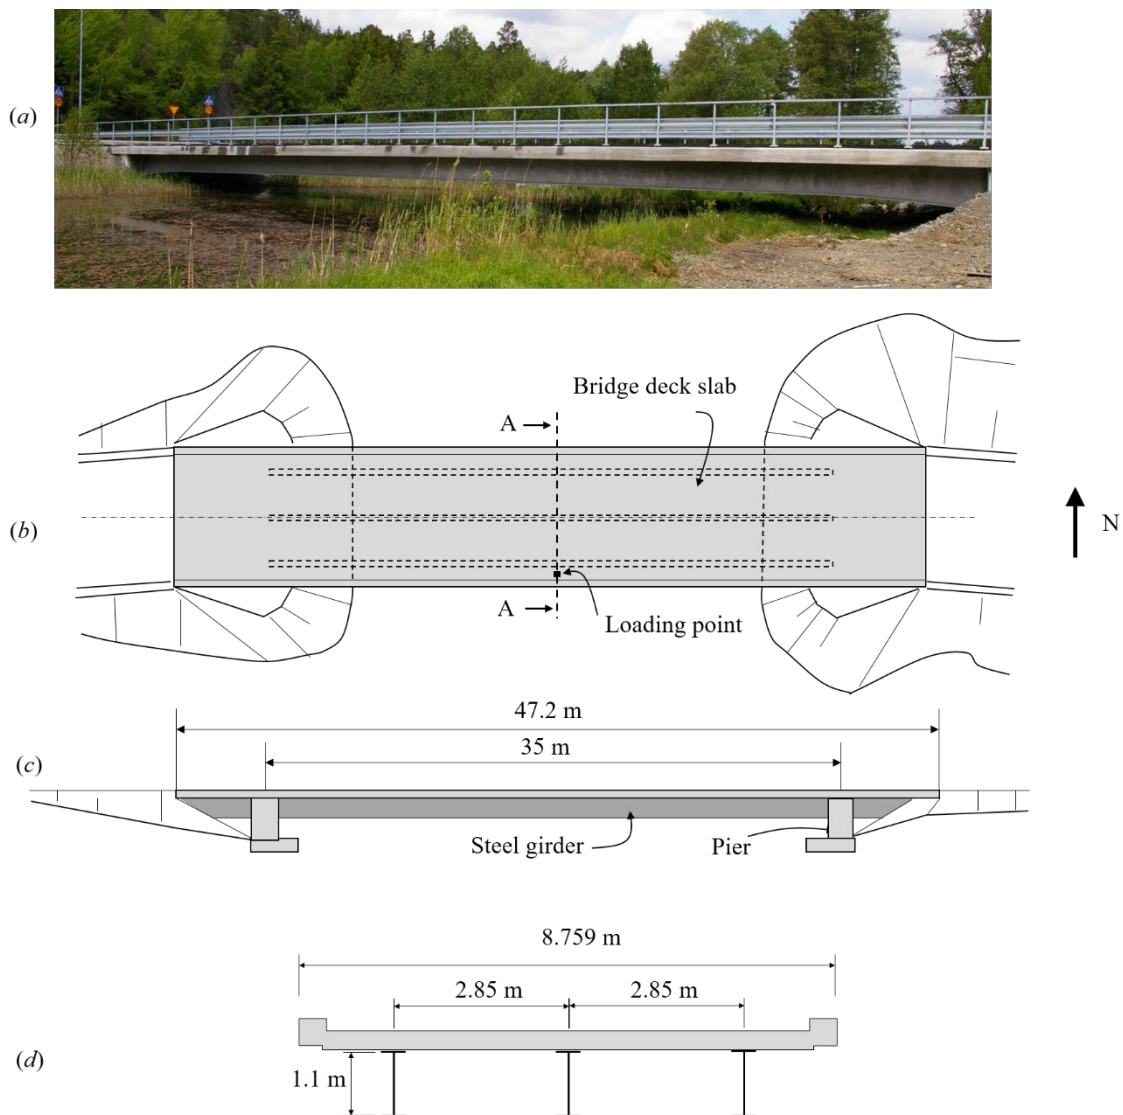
(a) Photo of the bridge used for example 3, (b) plan view of the bridge, (c) side view of the bridge; section A-A is subjected to the concentrated load; (d) cross-section of the bridge. From Shu *et al.* (2019).
